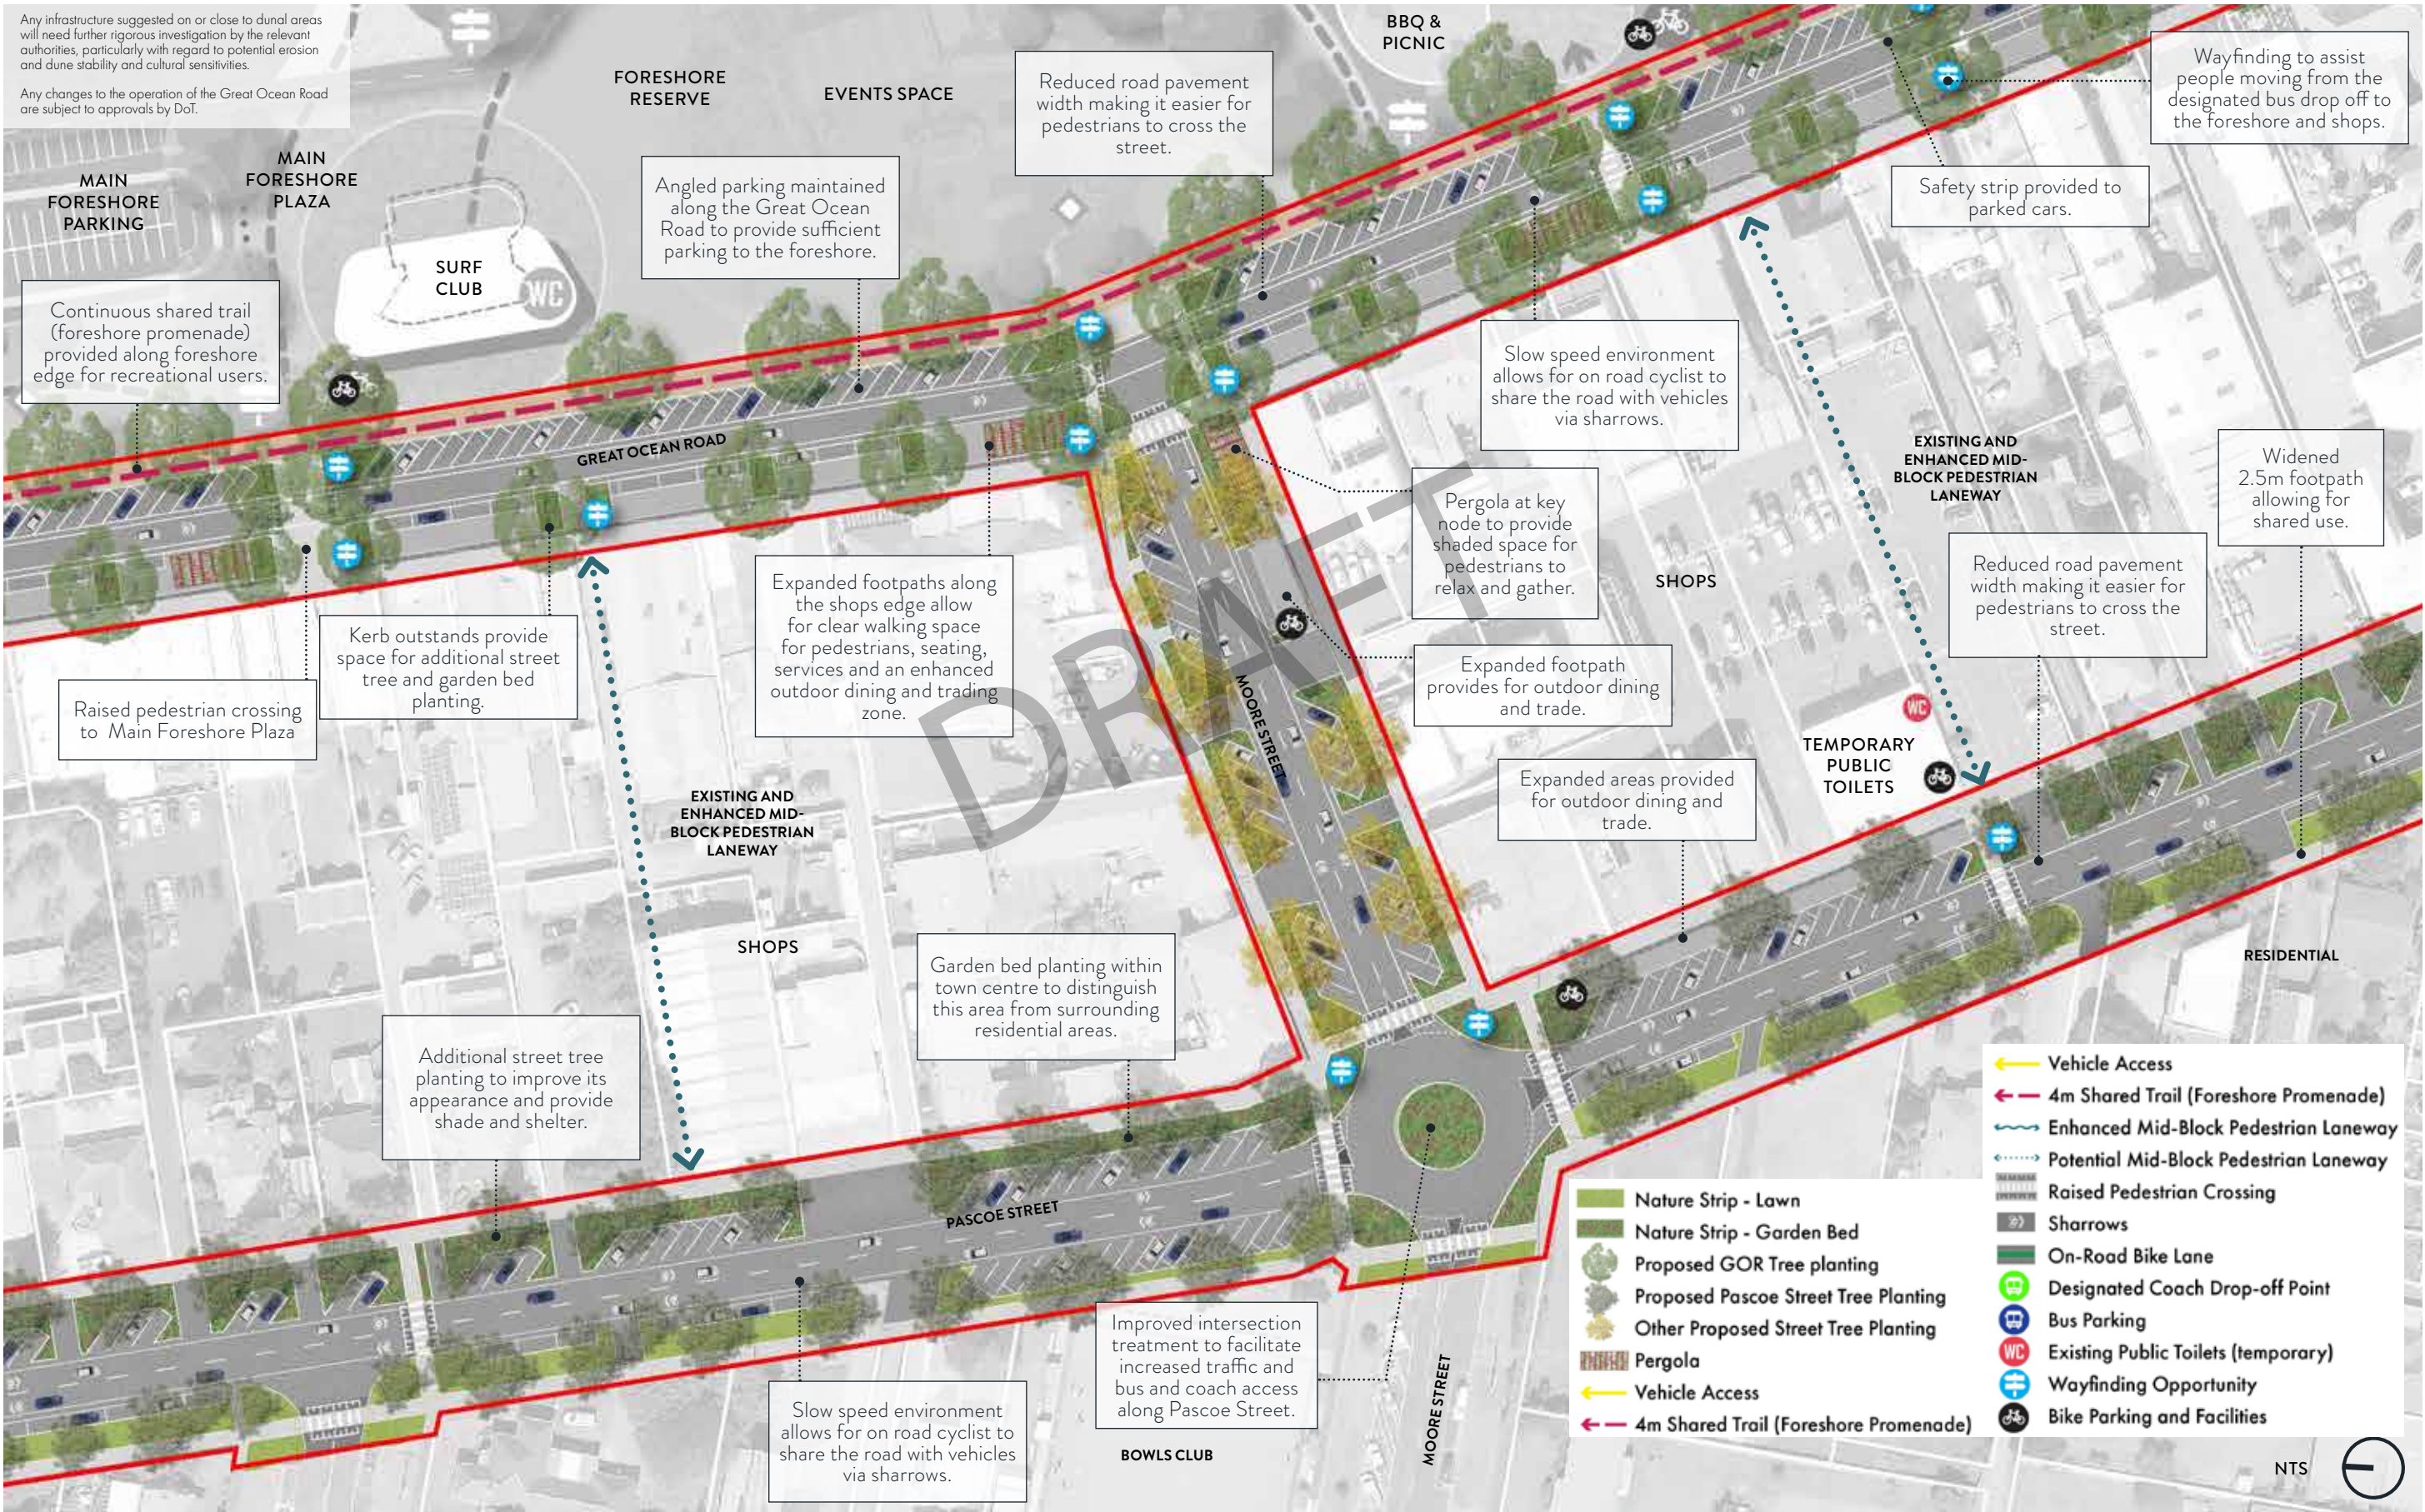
Detailed Streetscape Plan 2 - Option 1 - One-Way
